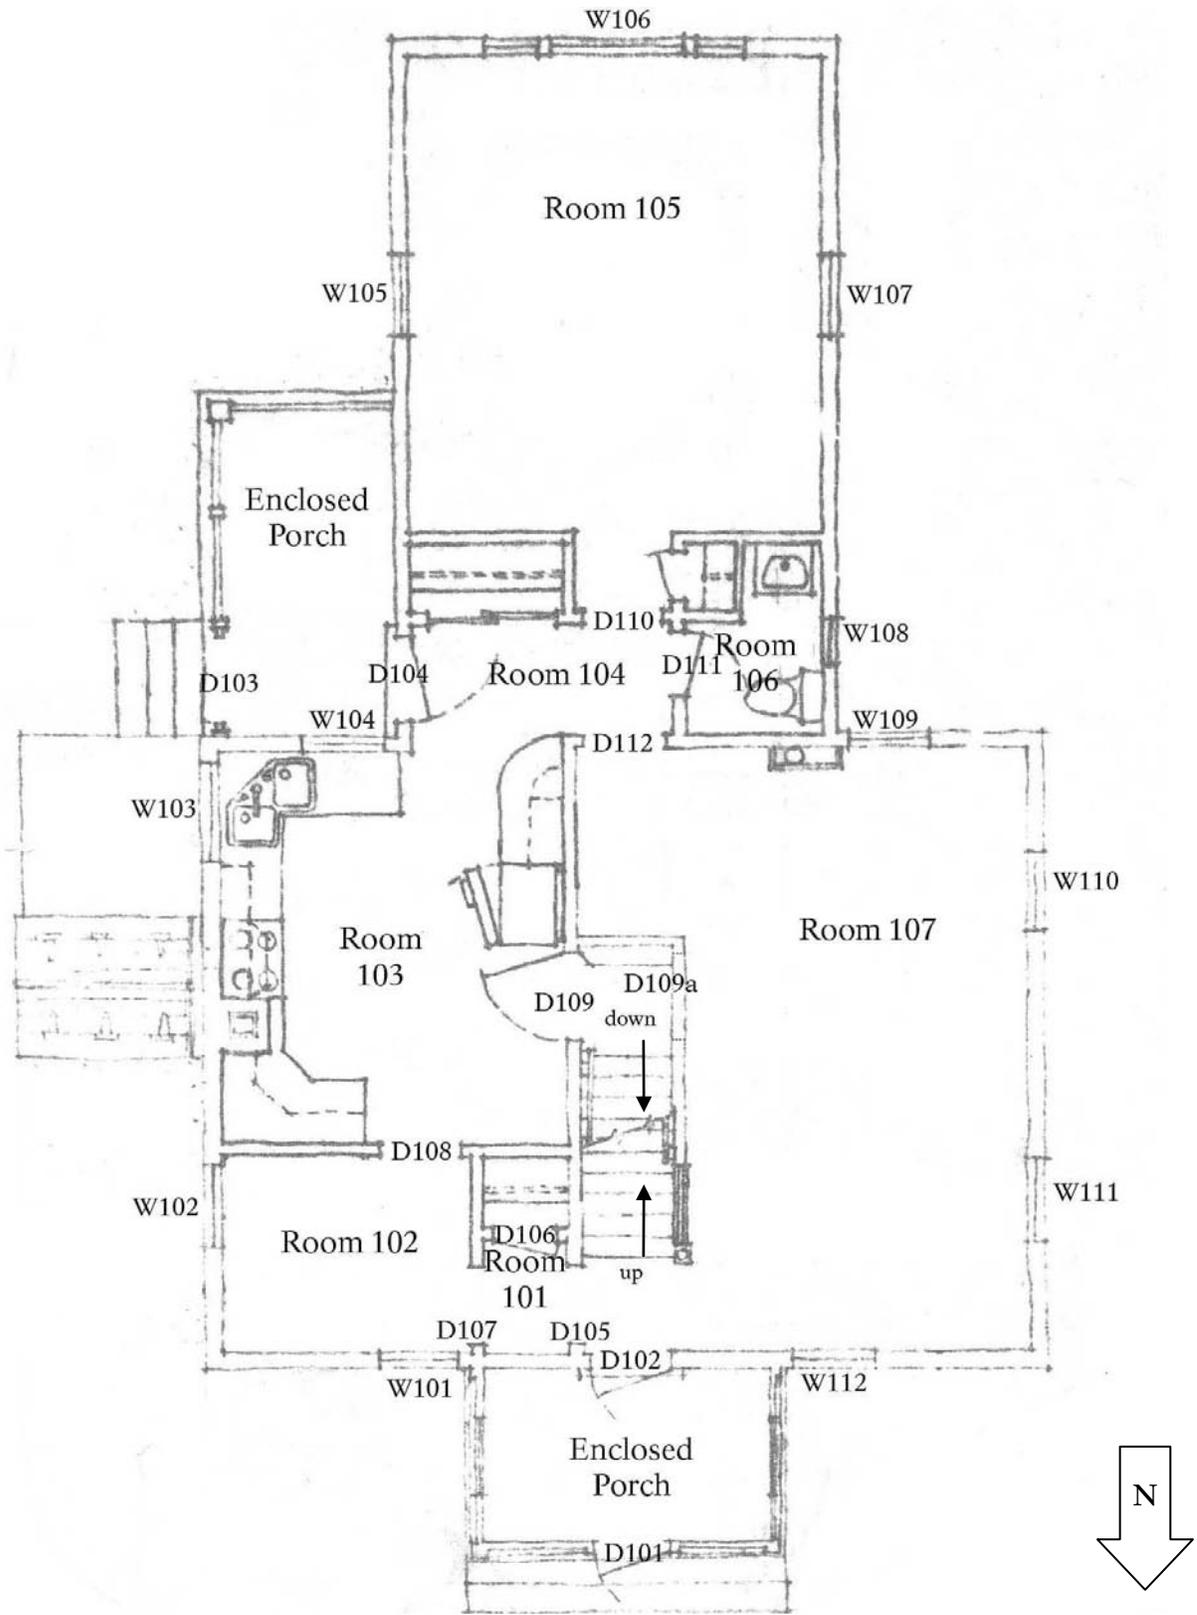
Gray Cottage, first-story floor plan with room, doorway, and window-opening numbers assigned for the current project.
